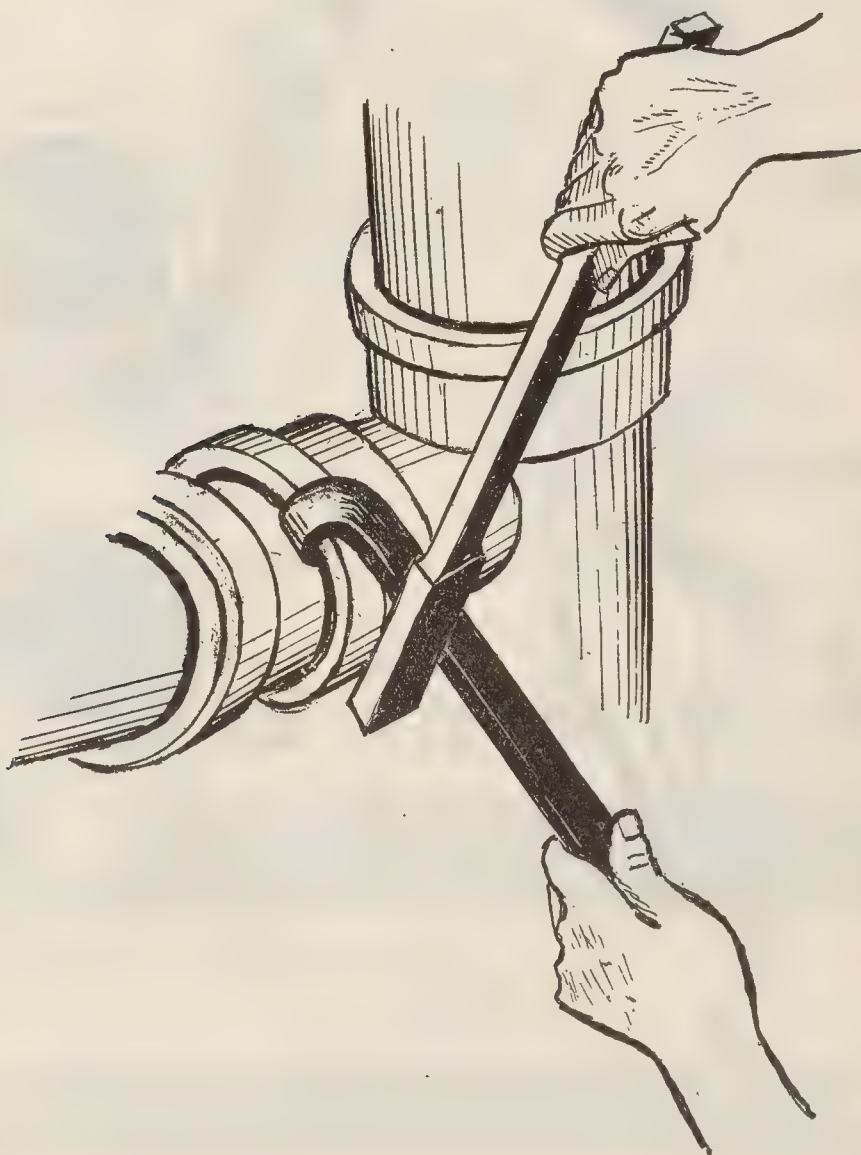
,845.—Method of using Mueller helper pattern caulking iron in caulking branch of T fitting.
